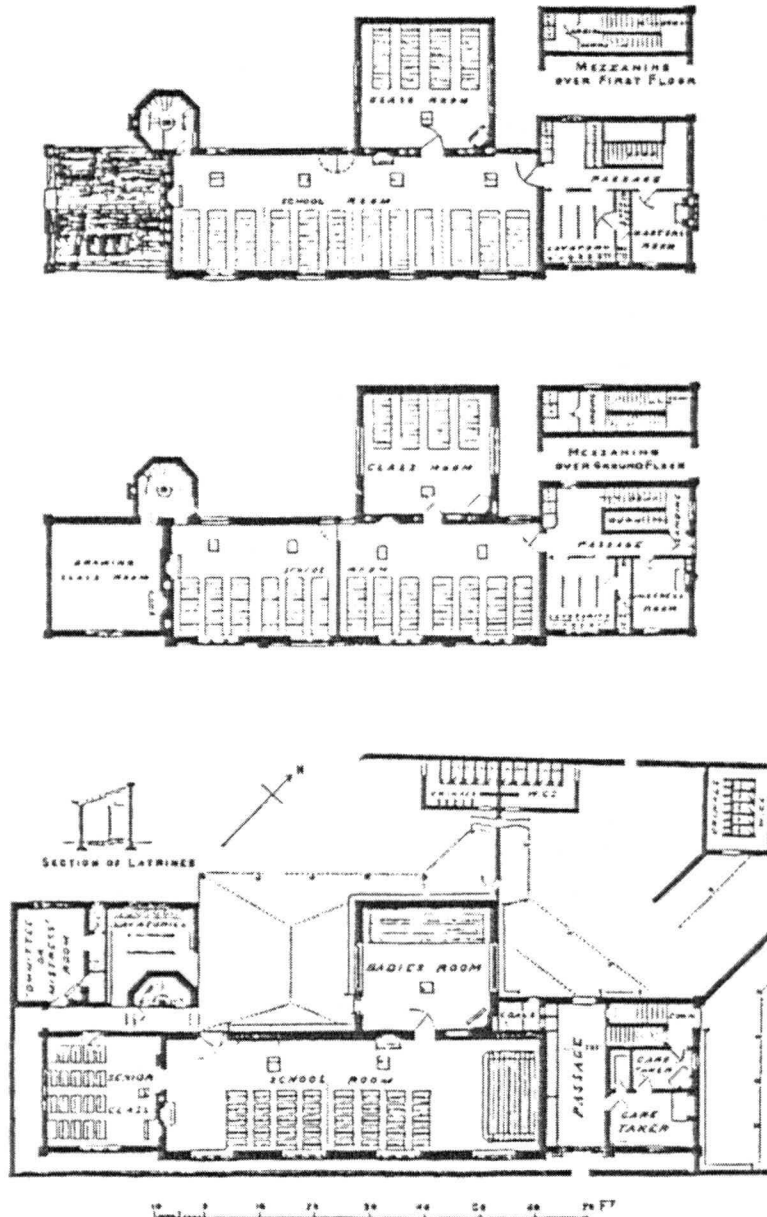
Harwood Road Board School, plans: *top*: second floor (boys); *middle*: first floor (girls); *bottom*: ground floor (infants); woodcuts from E.R. Robson's *School Architecture* (1874), figs. 203, 204, and 205; these plans show the school as *originally designed*; it was actually built as a mirror image of these plans, and is thus shown in the woodcut in fig.1.
